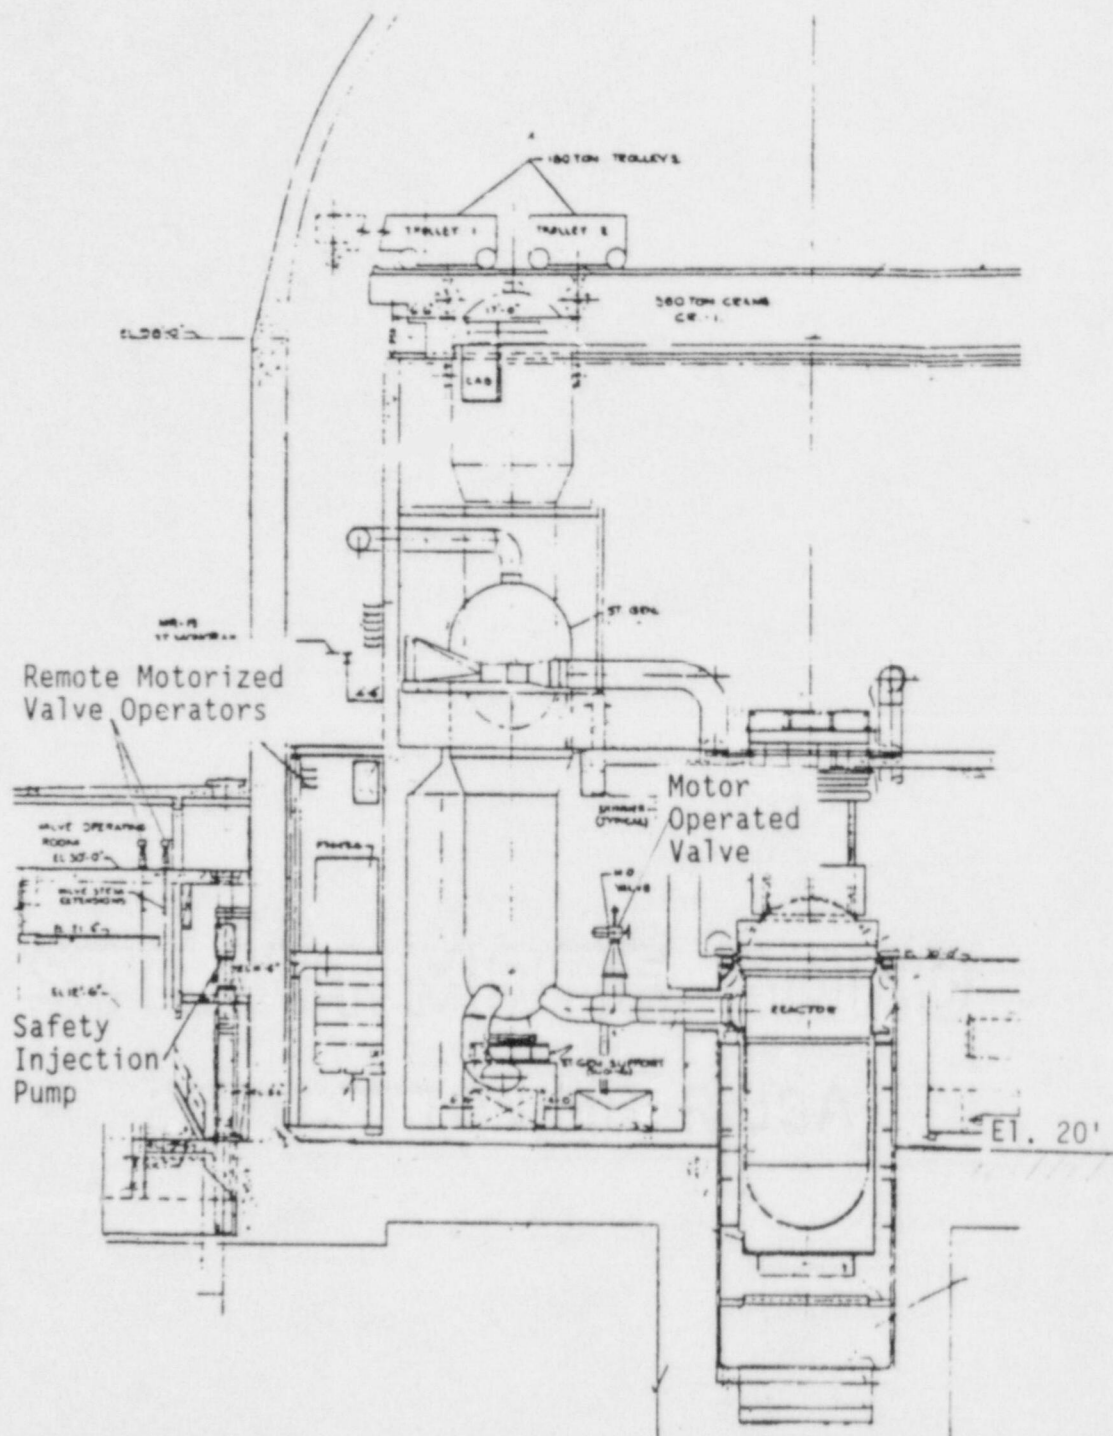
Elevation of the Reactor Containment Showing Critical Equipment Locations.
